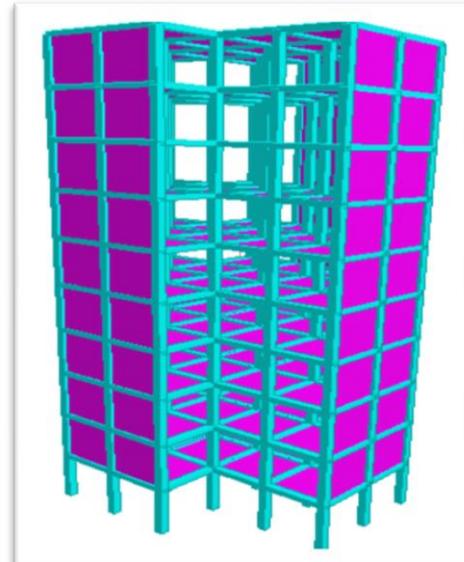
STRUCTURE WITH OUTER SHEAR WALL
